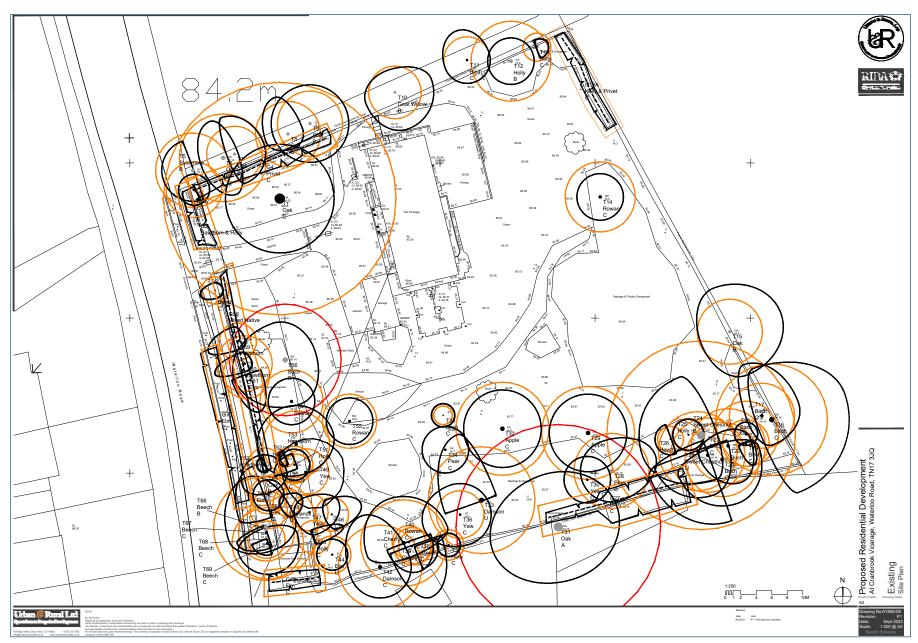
Existing site plan (Urban & Rural Ltd., Drawing no. A1606-05 P1, dated Sept 2022).
